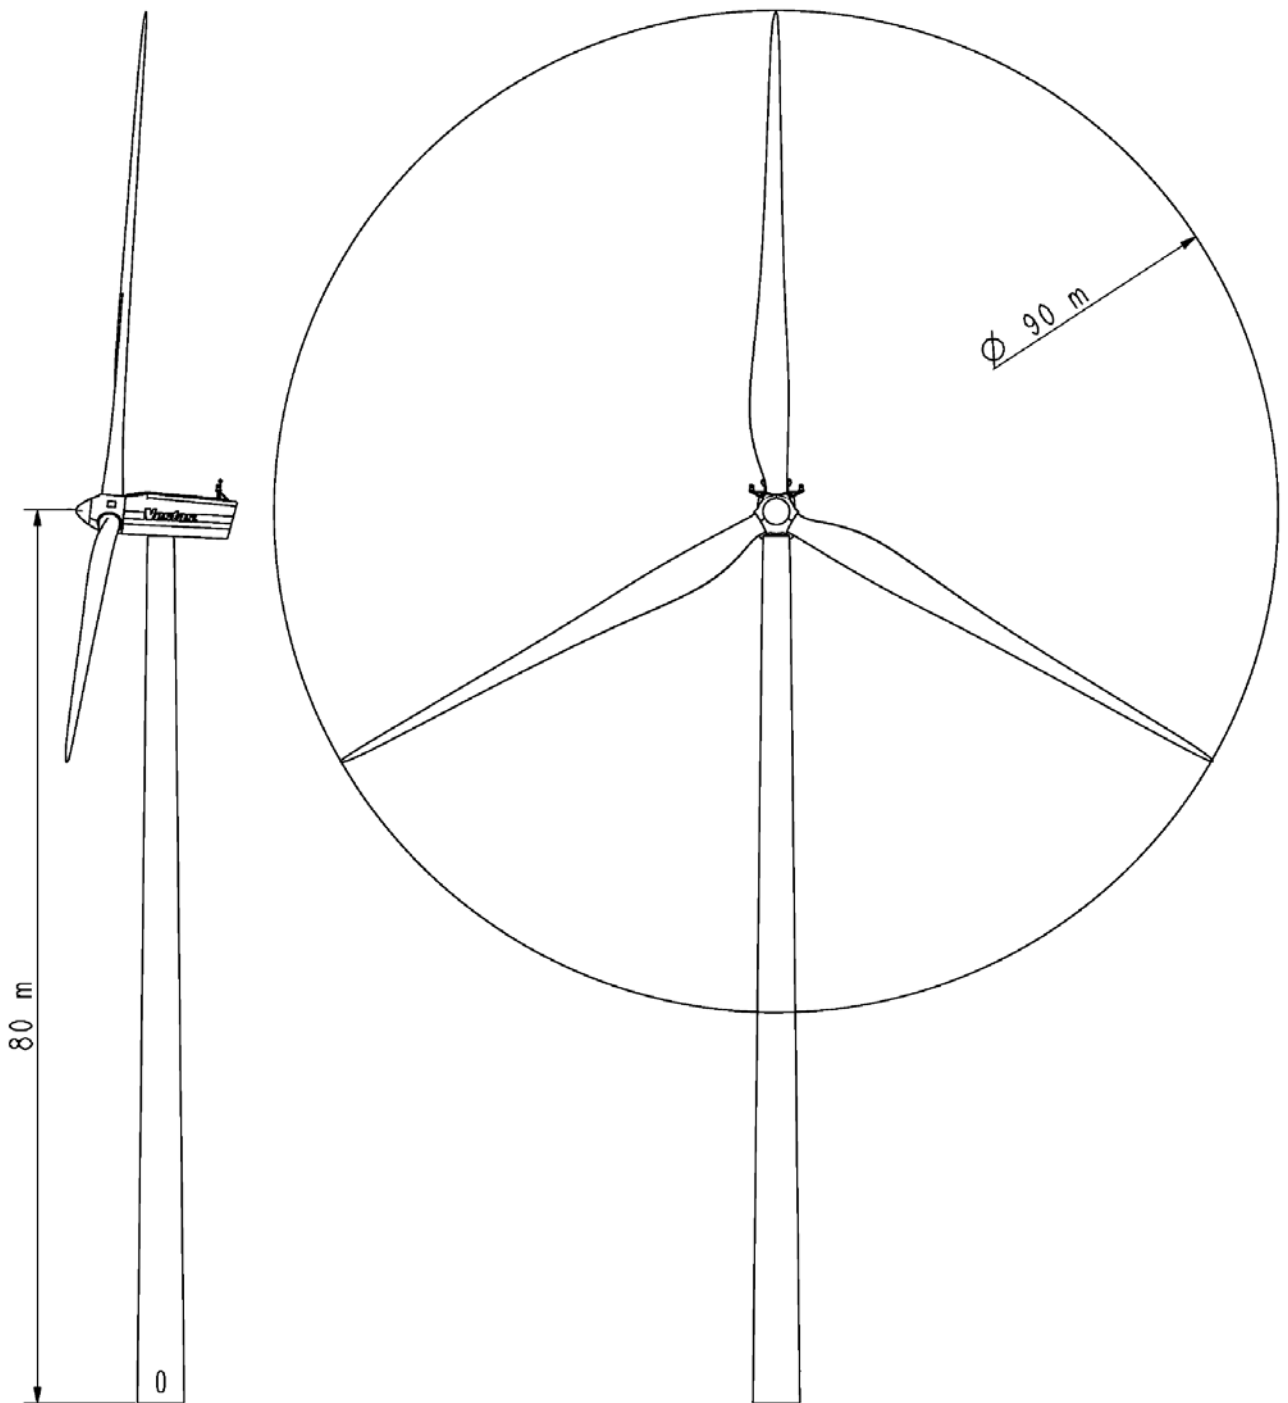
Illustration of outer dimensions – structure (Drawing no. 956042)
